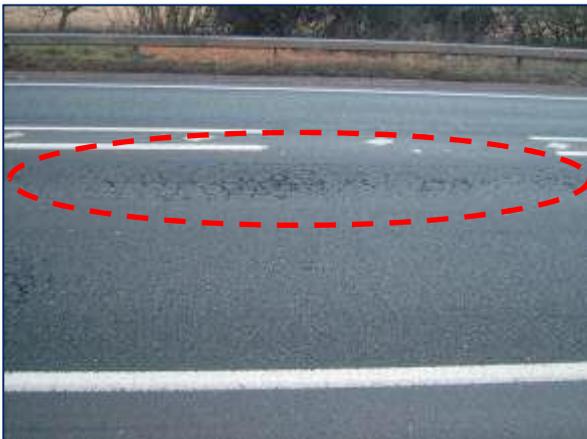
L+T cracks in SB lane (Section 1900A5/171, ch. 0 m)
